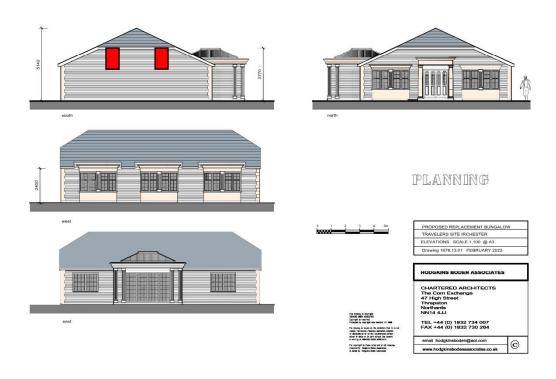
Site Elevation Plan showing the locations of the bat boxes on site (as shown by the red shapes). Please note: this image is not to scale.
